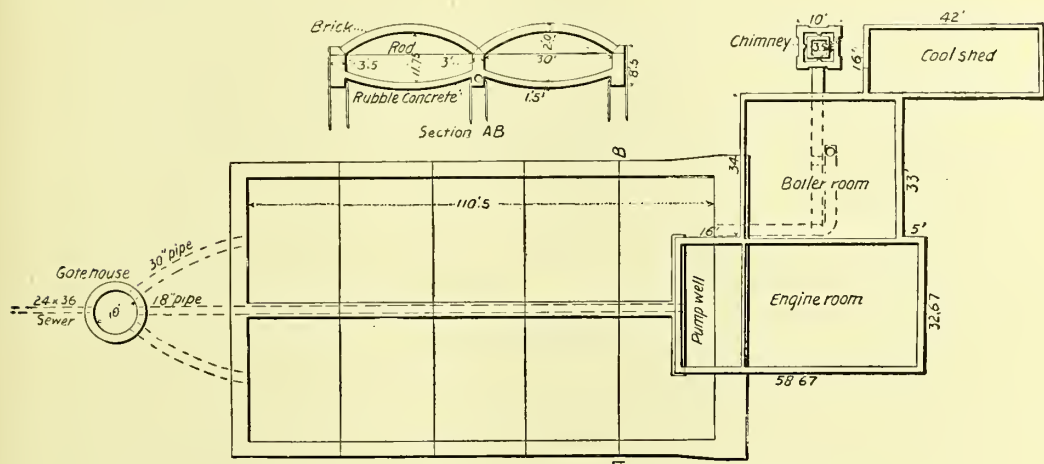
PLAN OF RESERVOIRS AND PUMPING STATION, SOUTH FRAMINGHAM, MASSACHUSETTS.
